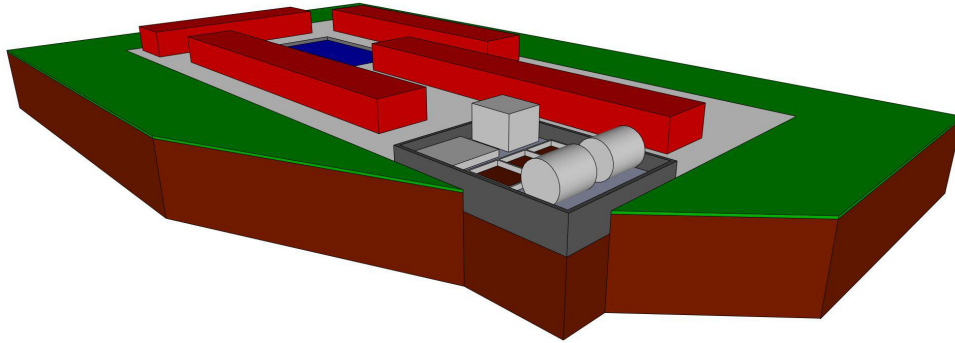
3D schematisation of the embedded wall around the waste water treatment plant
